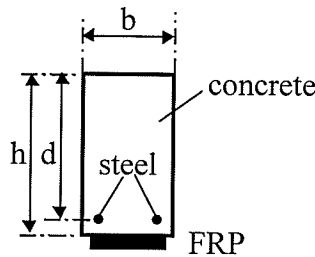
Cross section of a reinforced concrete beam strengthened with FRP laminate
